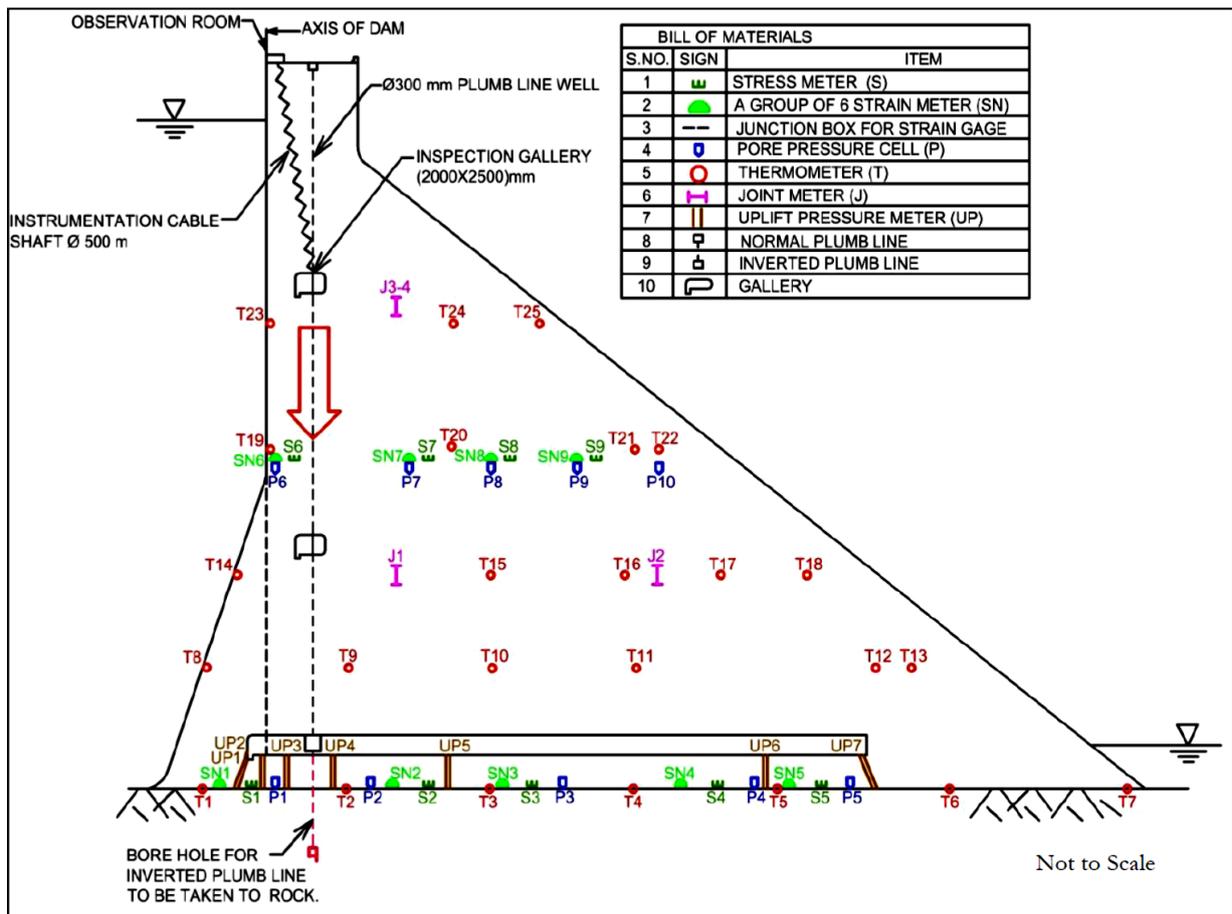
Illustration of typical a monitoring system for a concrete or masonry dam (CWC, 2018)
